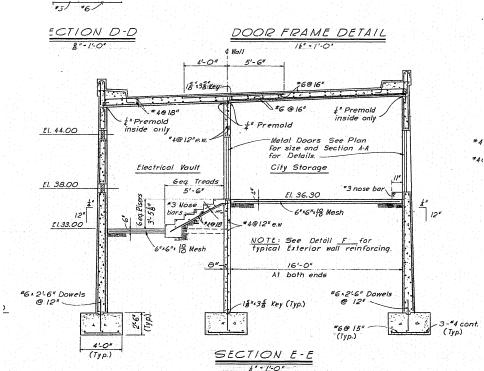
Abutment 3 Electrical Vault, thin wall with dowels connected to footing. Vault room could collapse and affect the electrical supply for Hawthorne bridge
